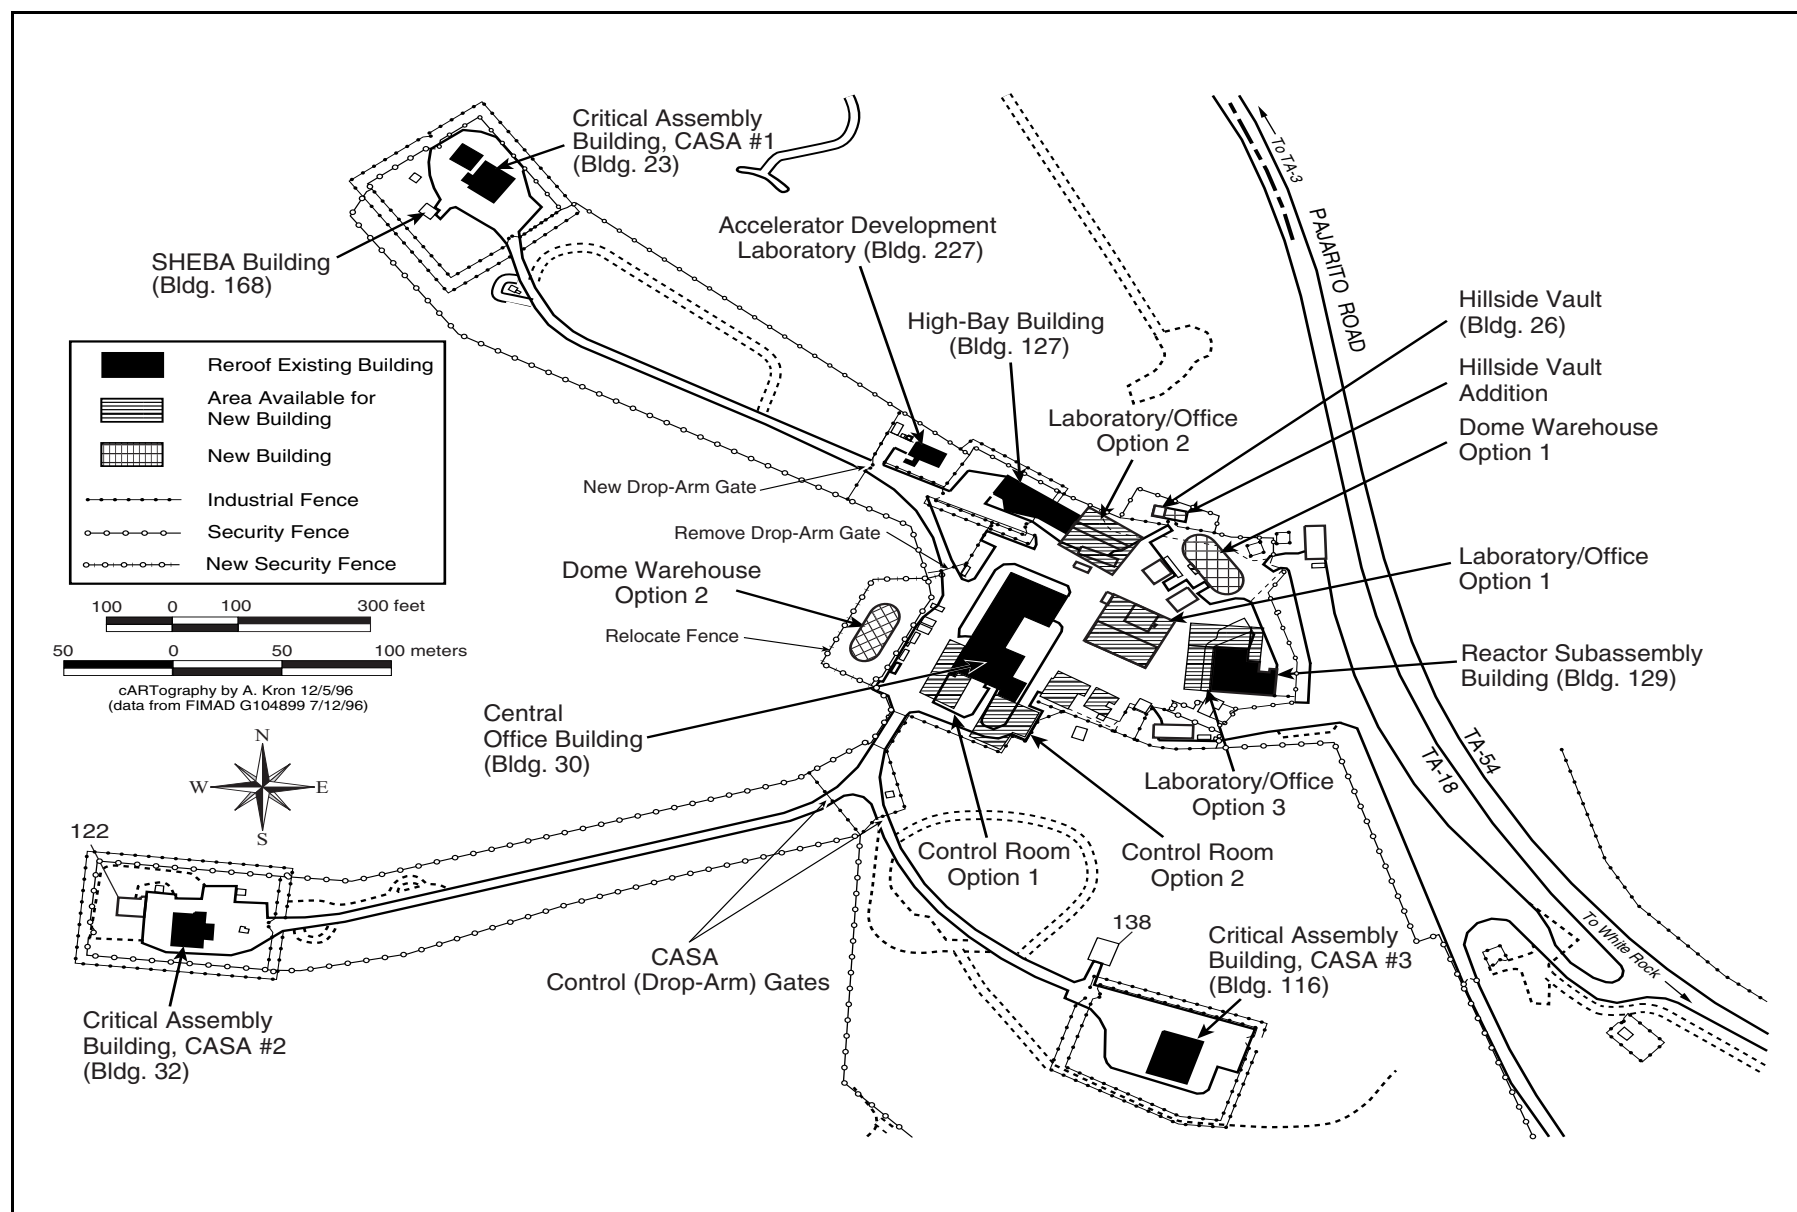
TA-18 Proposed Modifications Plan (TA-18 Upgrade Alternative)
